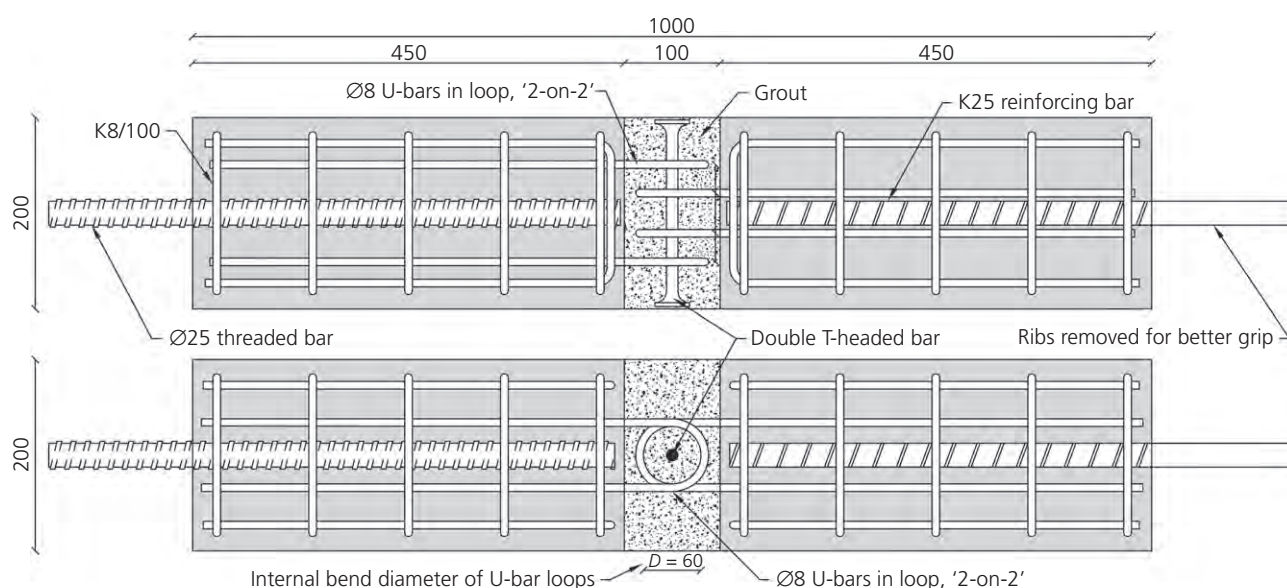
General geometry of test specimen, including reinforcement details (dimensions: mm)
